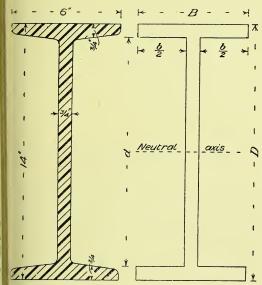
Section of Rolled Joist. Fig. 1683.— Determining Strength of Rolled Joist by Moment of Inertia,
